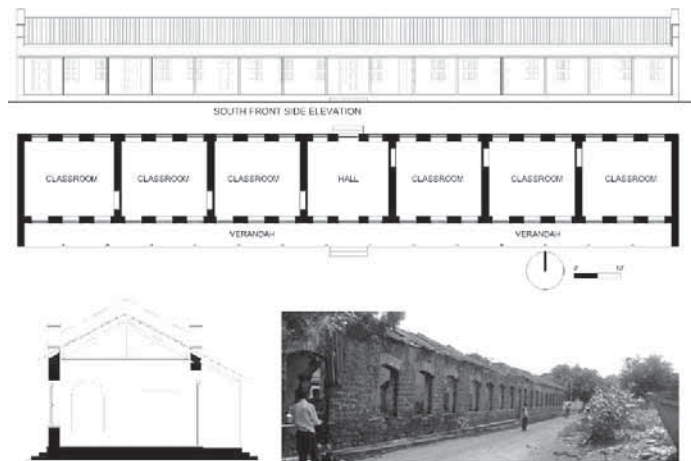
Konapure Chawl School, 1923: South Front Elevation, Ground Floor Plan, Transverse Section and North View
